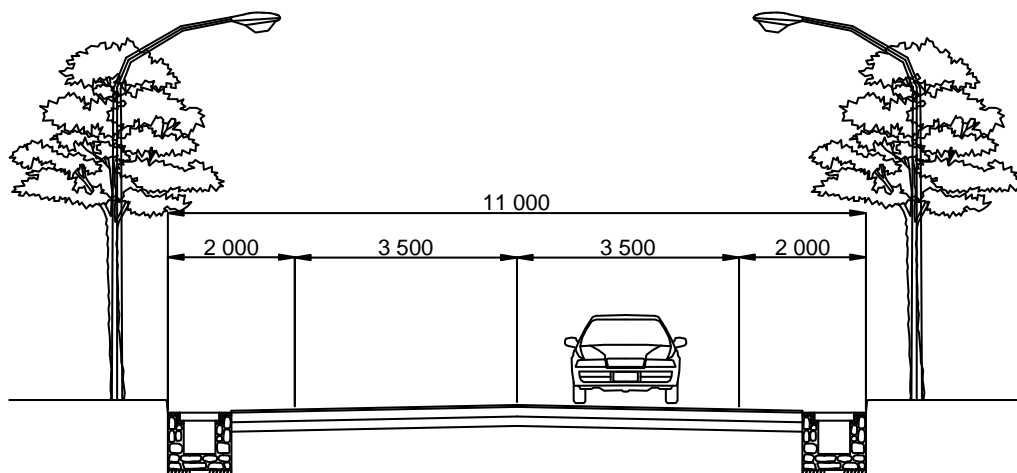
Proposed U-Type Ditch on Town Section
